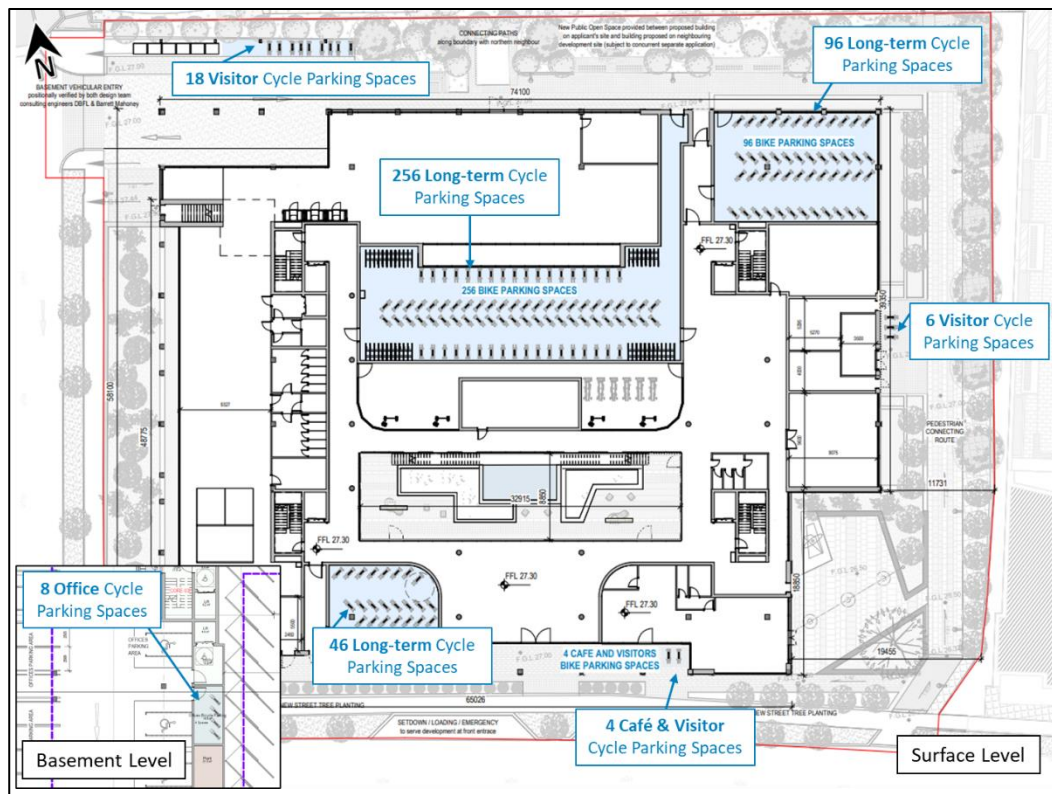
Proposed Long & Short Stay Cycle Parking Locations
